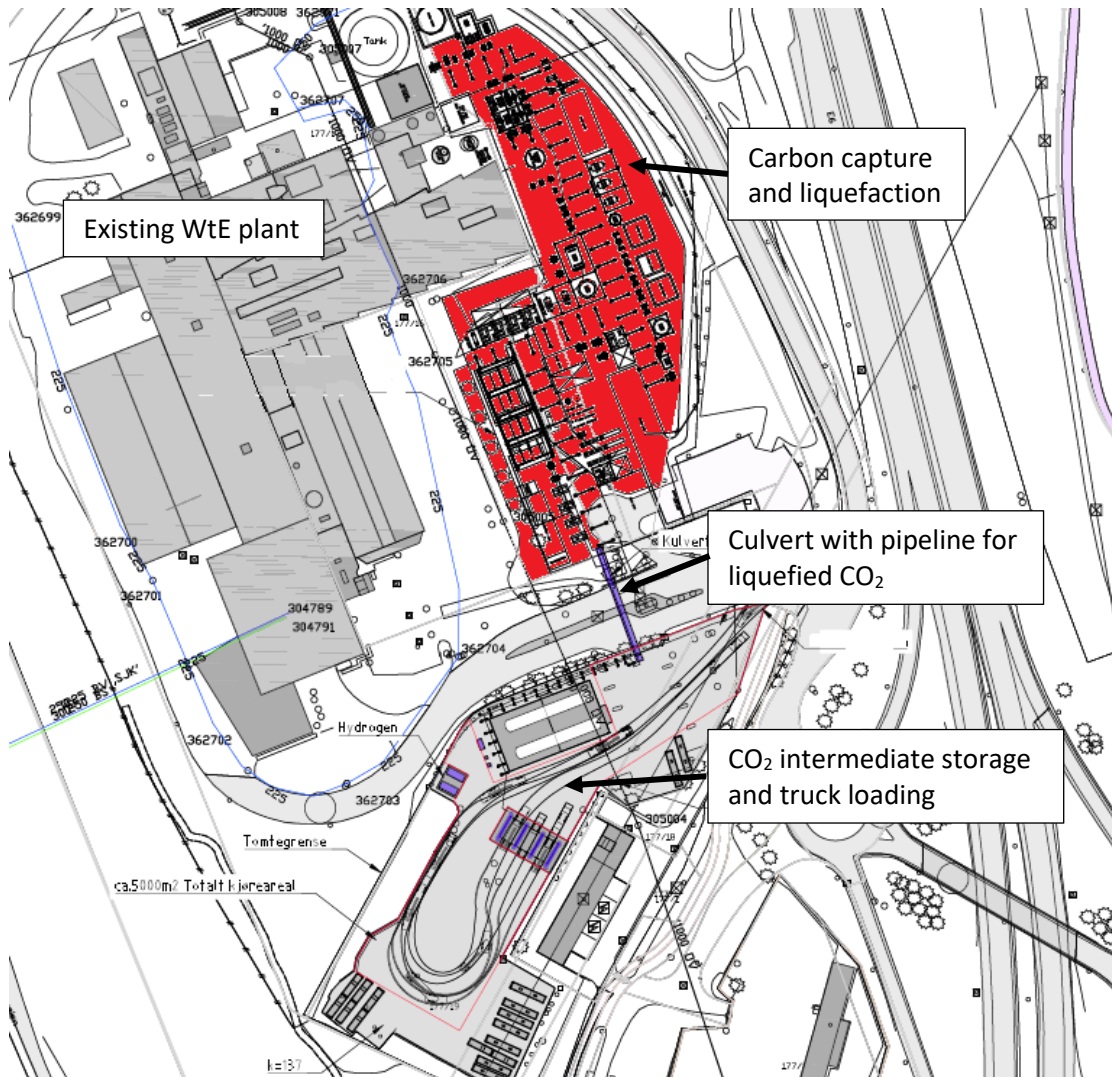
Original WtE plant marked with grey, CO₂ capture plant to the east.
